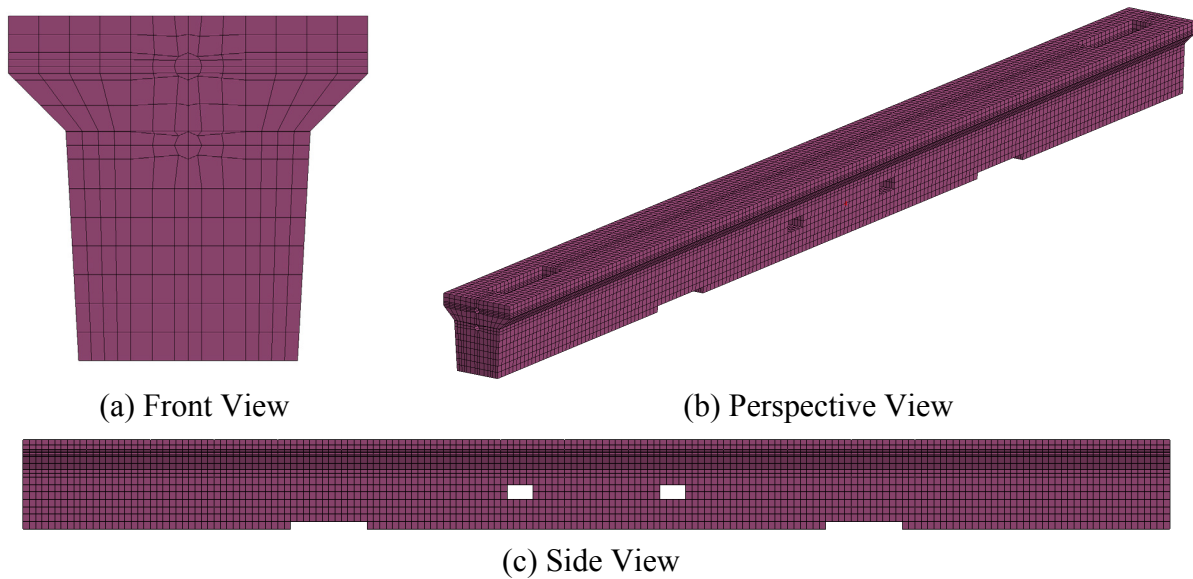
Front, Perspective and Side Views of a Segment of the 24-Inch Tall PCB Model
